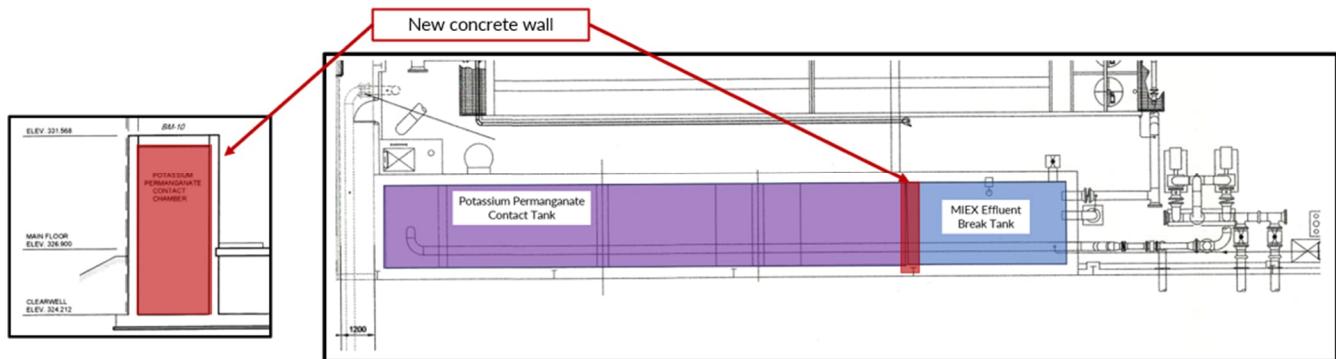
Partial Plan of Existing Potassium Permanganate Tank – New Concrete Wall to Form Break Tank
